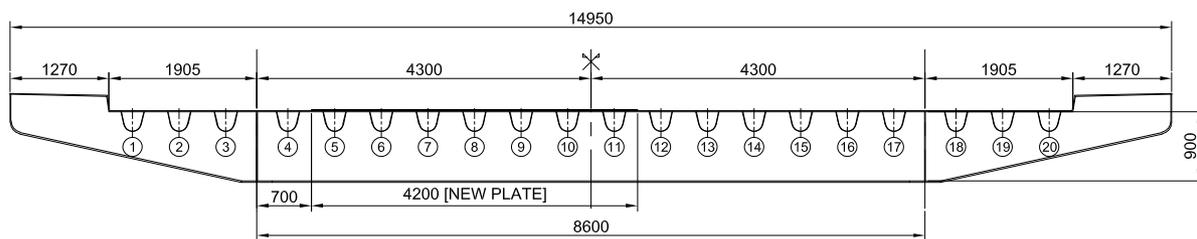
Cross section of Scharsterriijn movable bridge and new plate position (dimensions in mm).
